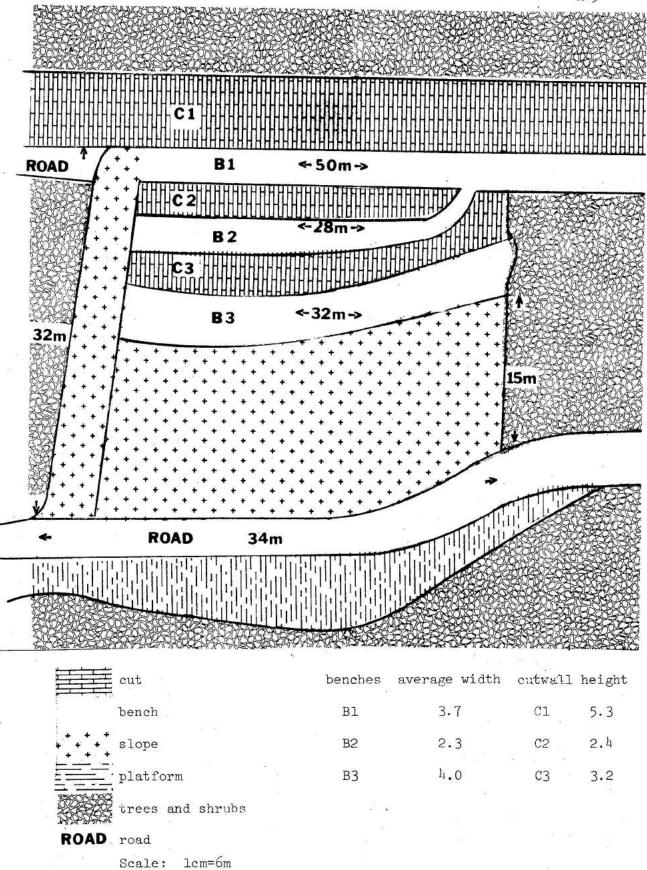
Site B layout. Northeast-facing. Road at forefront provides access to Harry Creek and then on to Marshall Creek.
